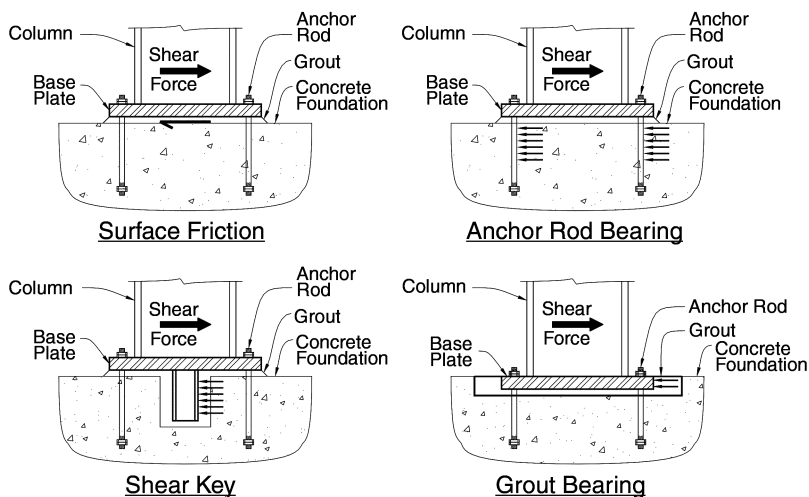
Shear transfer mechanisms—column supported by foundation.
